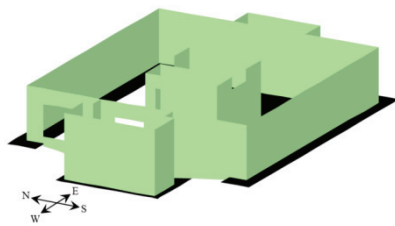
Structural configuration of the Millikan Library basement showing the structural walls and two-level foundation details, including the central pad (at EL. −6 m from the ground surface), and the two north and south foundation beams (at EL. −5 m from the ground surface).
